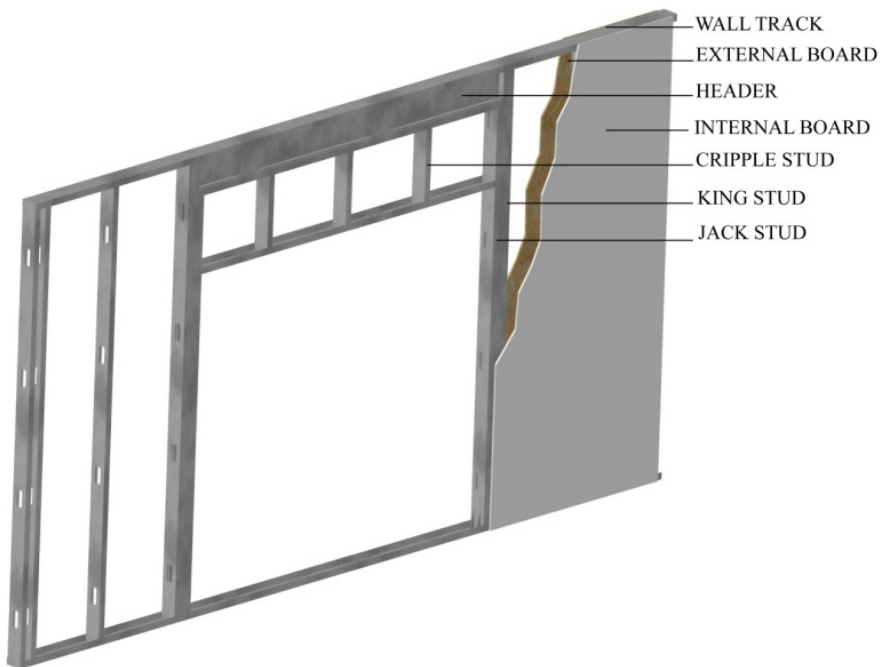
Typical wall framing (Iuorio, 2009)
